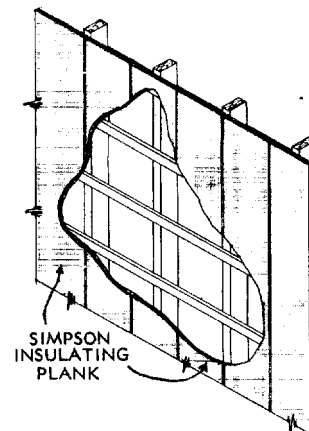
Simpson Insulating Plank Applied Vertically to furring strips nailed to studding.
